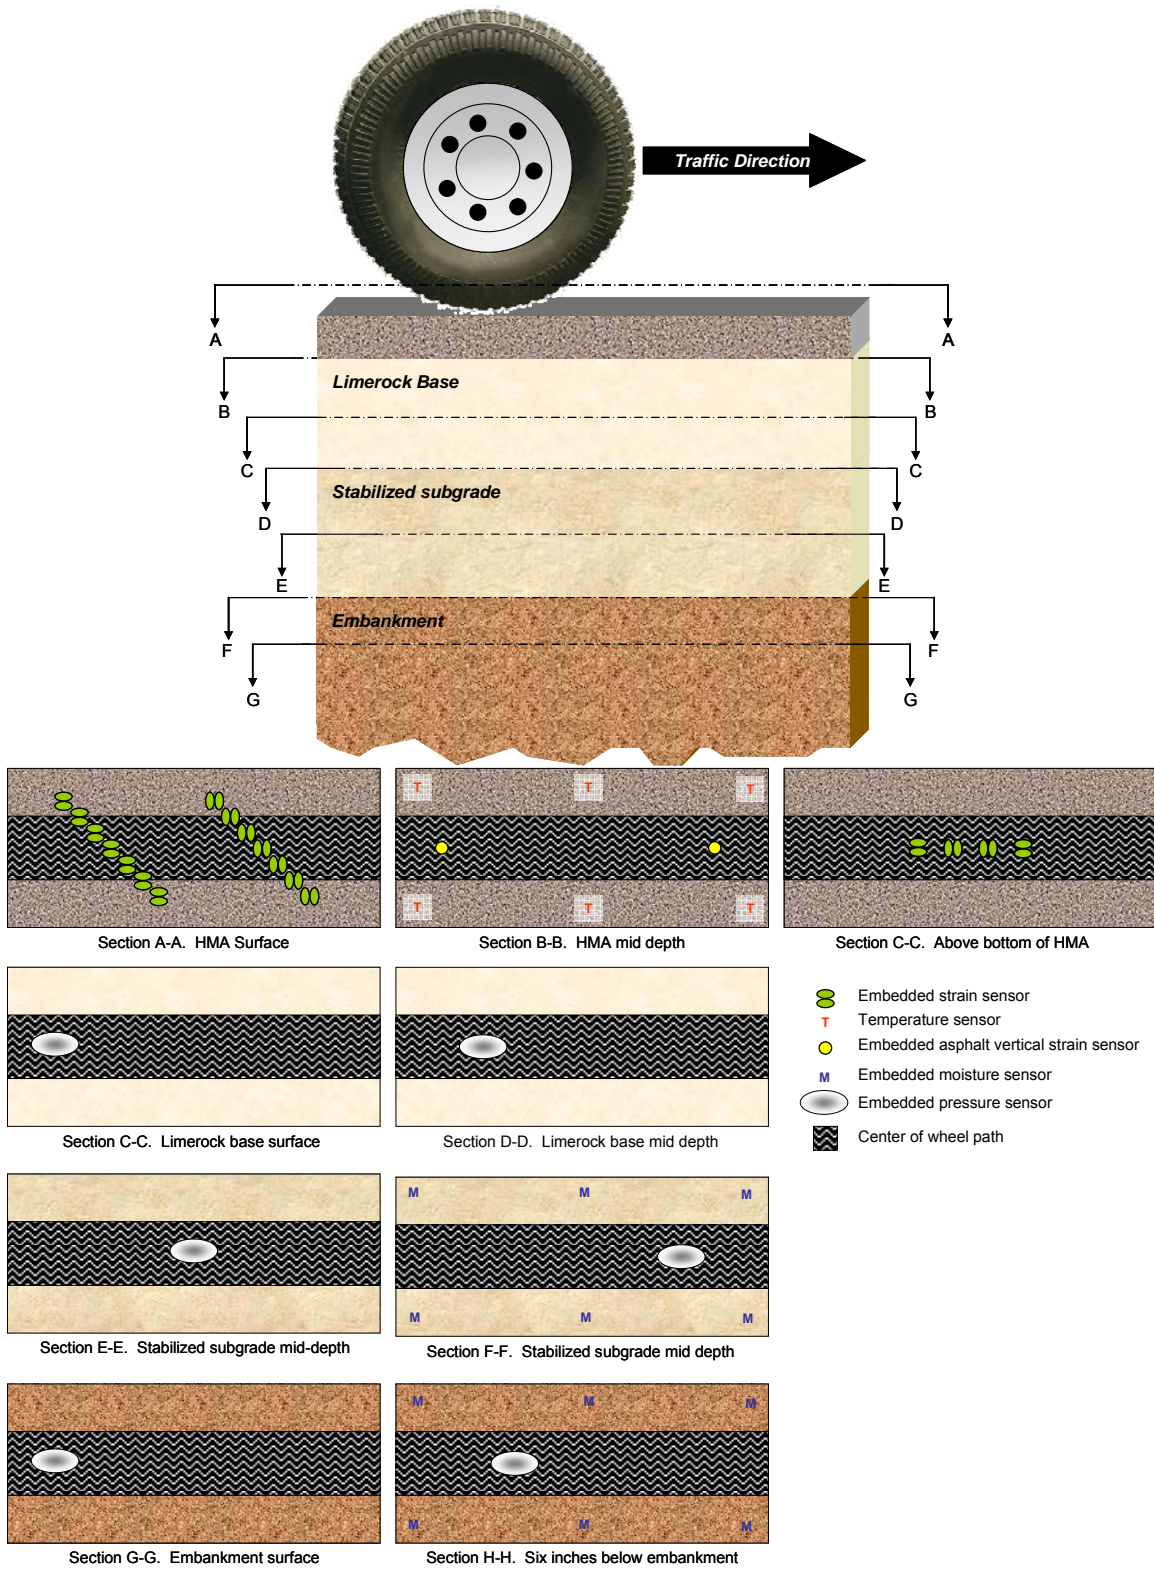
Illustration of an instrumented typical Florida flexible pavement.
